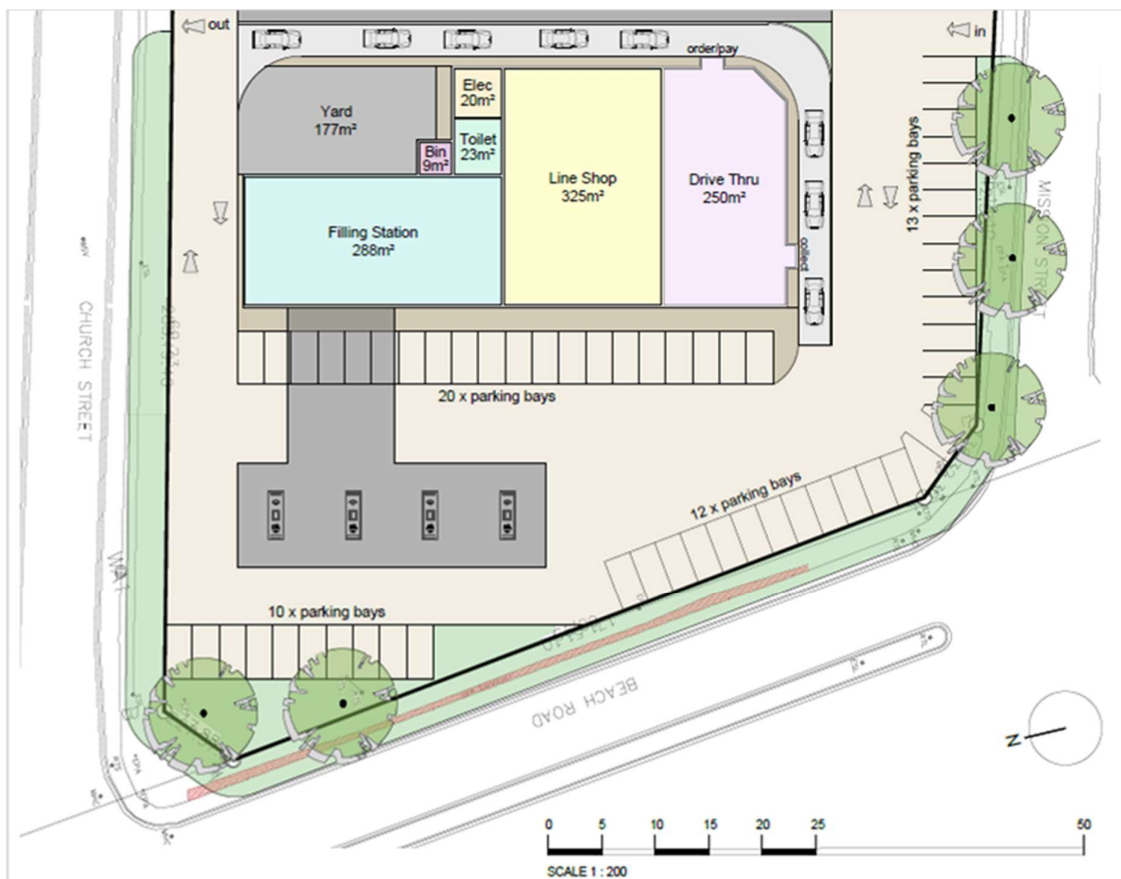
The Site Development Plans (SDP) Erf 7379 showing the proposed filling station, drive-through restaurant, shop, and associated infrastructure and facilities.
